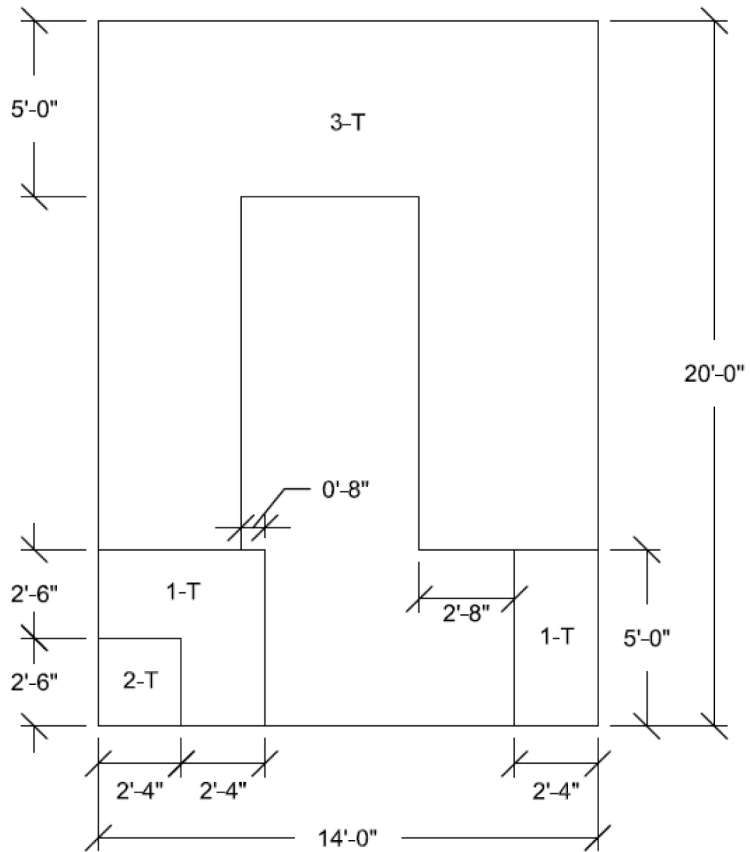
H.6-176B DGFSV Wall 9 Looking From Outside Transverse Reinforcement Zone
